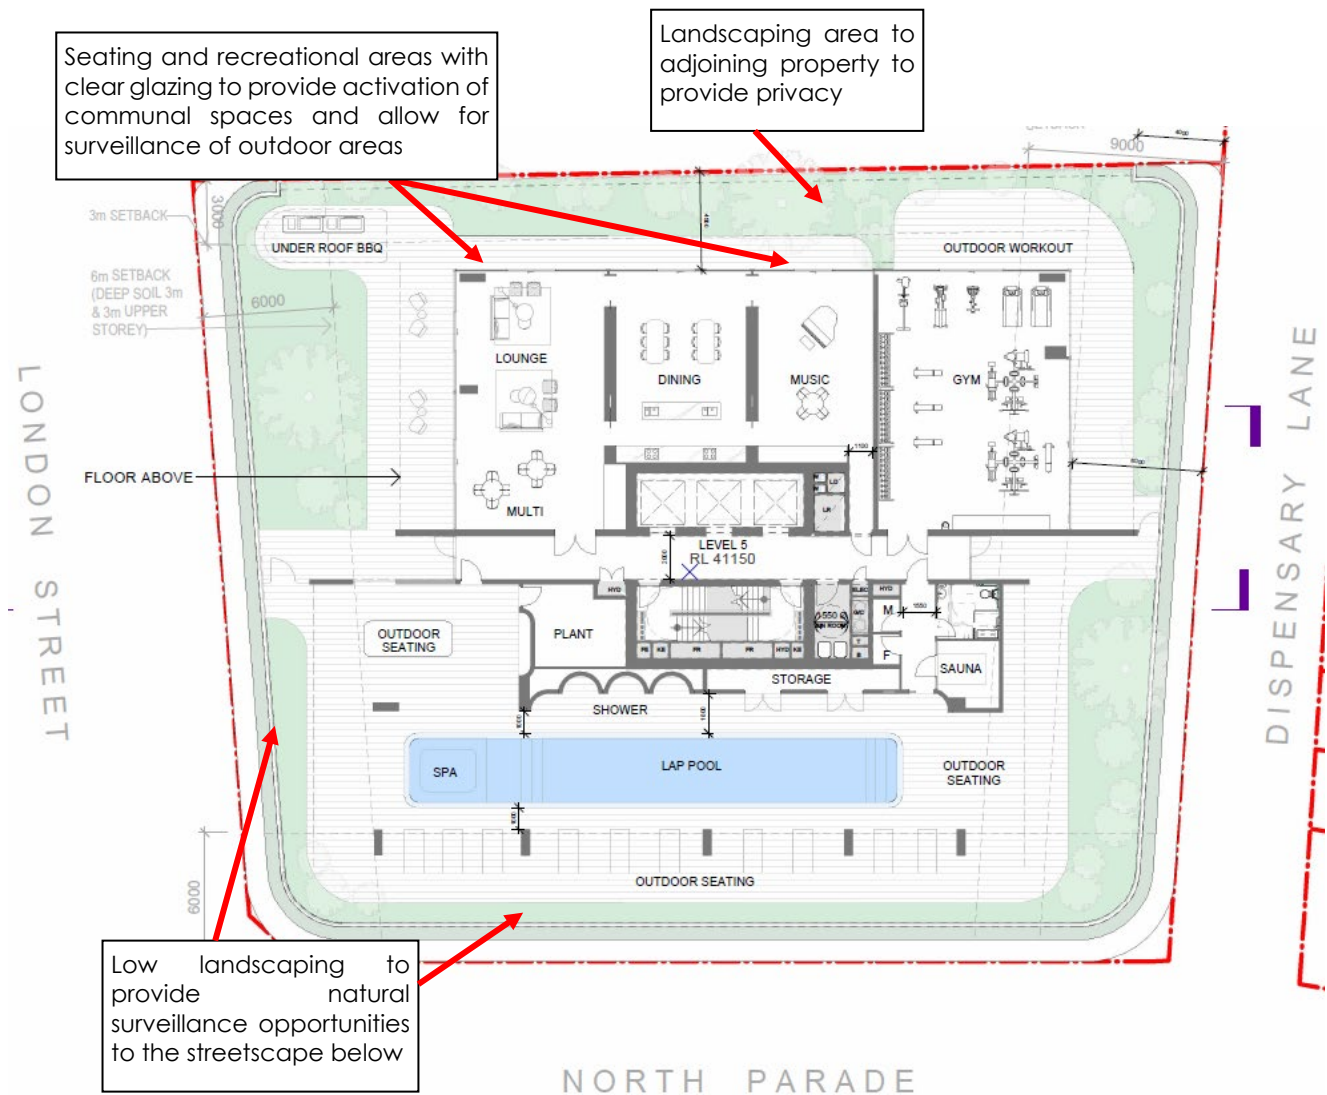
Extract of the level 5 plan showing the proposed communal open space areas (Woods Bagot, 2026)
